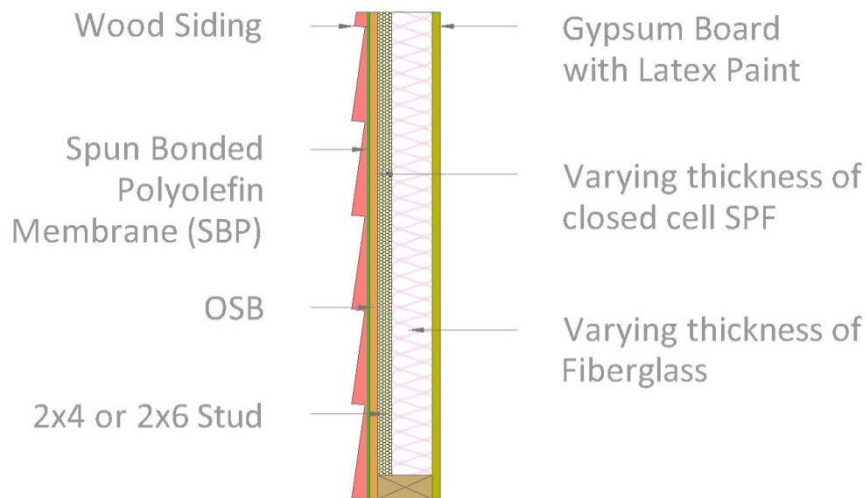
Typical wall construction for the walls built to code; cavity depth and foam levels vary depending on the climate
